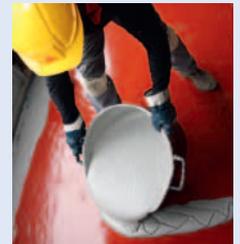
Pouring the SikaTransfloor®-352 to the floor
